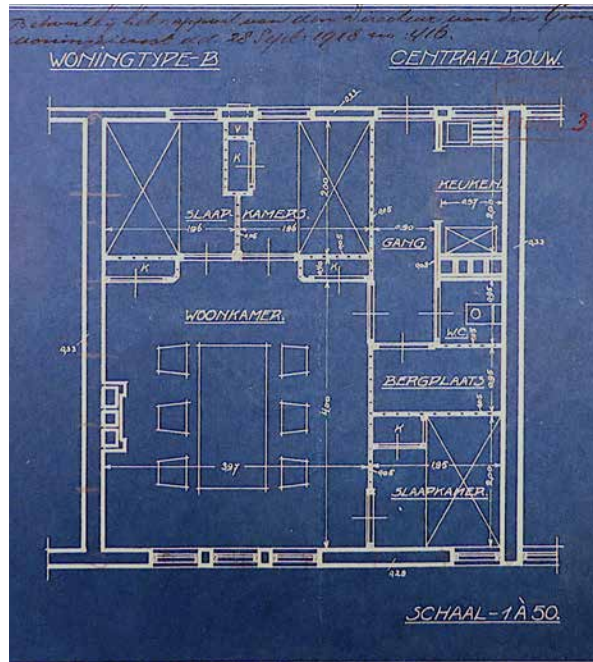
Floor plan type 'B' showing the projected garbage chute, marked 'V' (SAR: BRN 1190 (6)).
